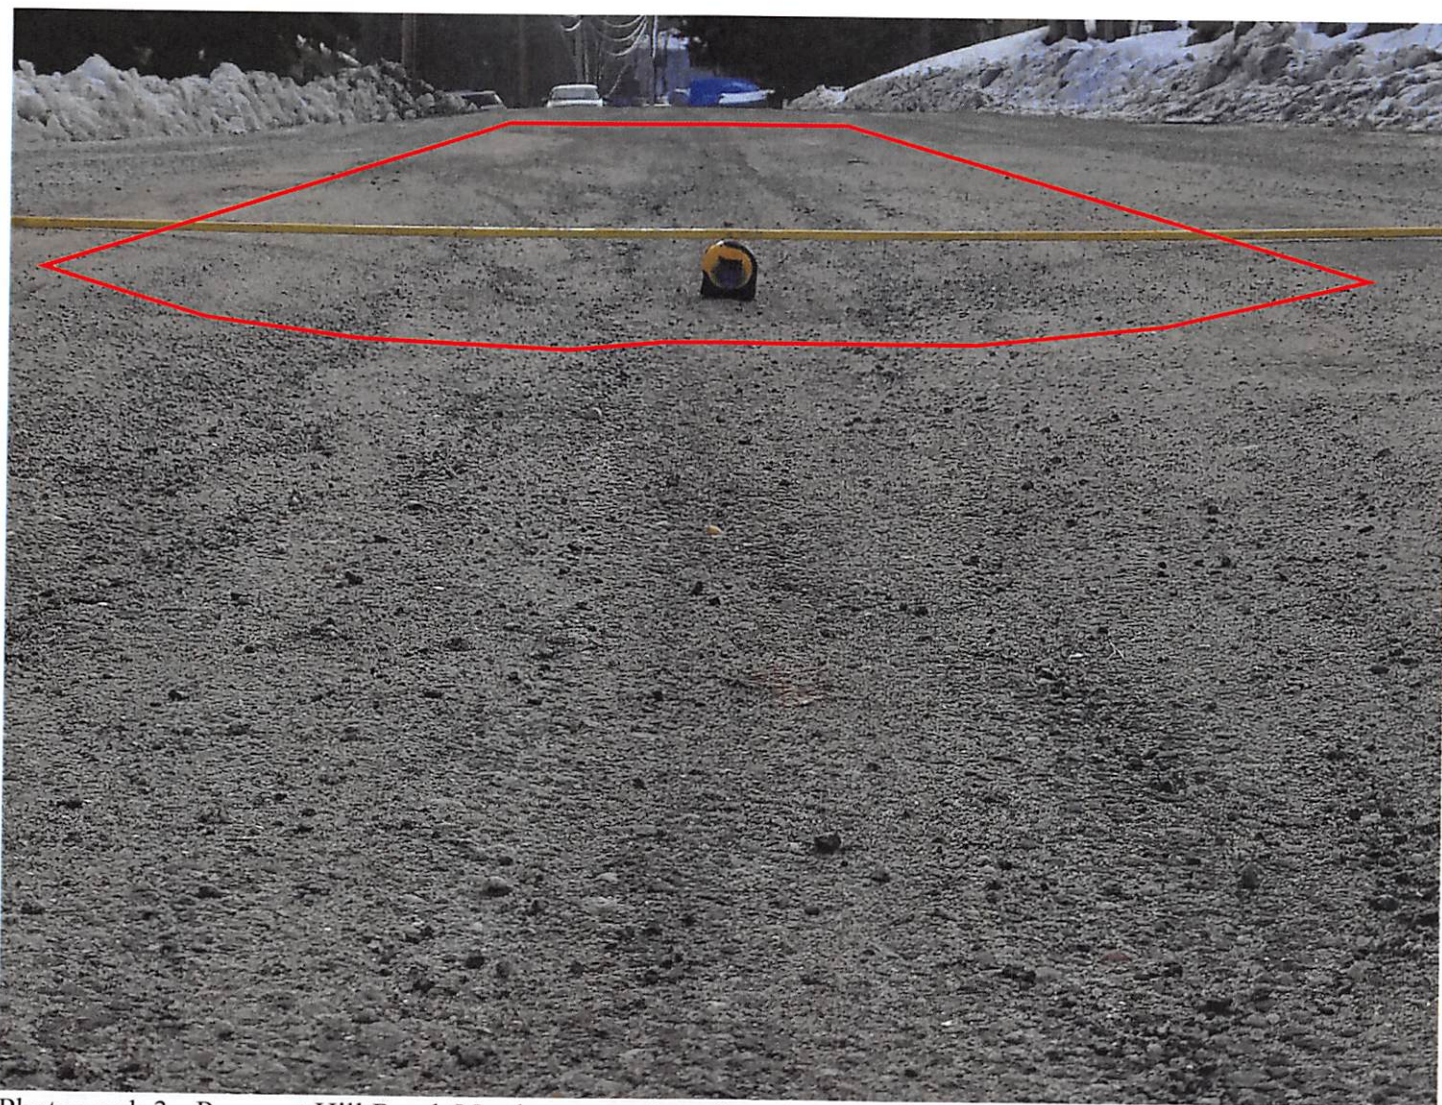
Prospect Hill Road (Northwest section of road): This photograph depicts severe alligator cracking across the northeast lane section, and to the full pavement depth. The photograph also depicts 2-inch to 5-inch rutting along the majority of the wheel zone. This road condition, or a variant of it, is evident from the northern Town line to approximately 2000-feet south east.
